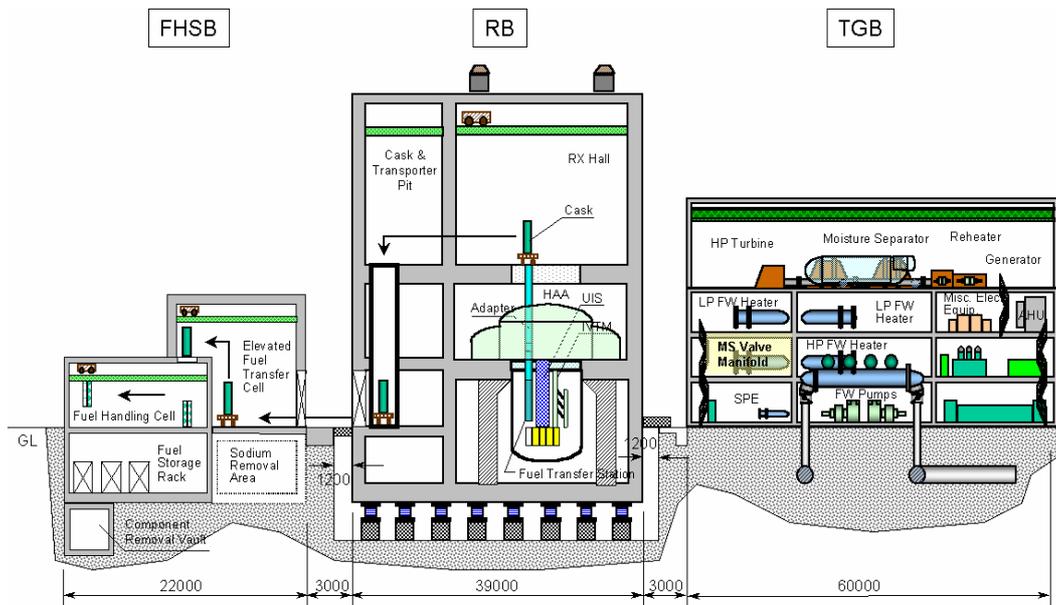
Section view of the fuel handling and storage building, reactor building, and turbine generator building.
